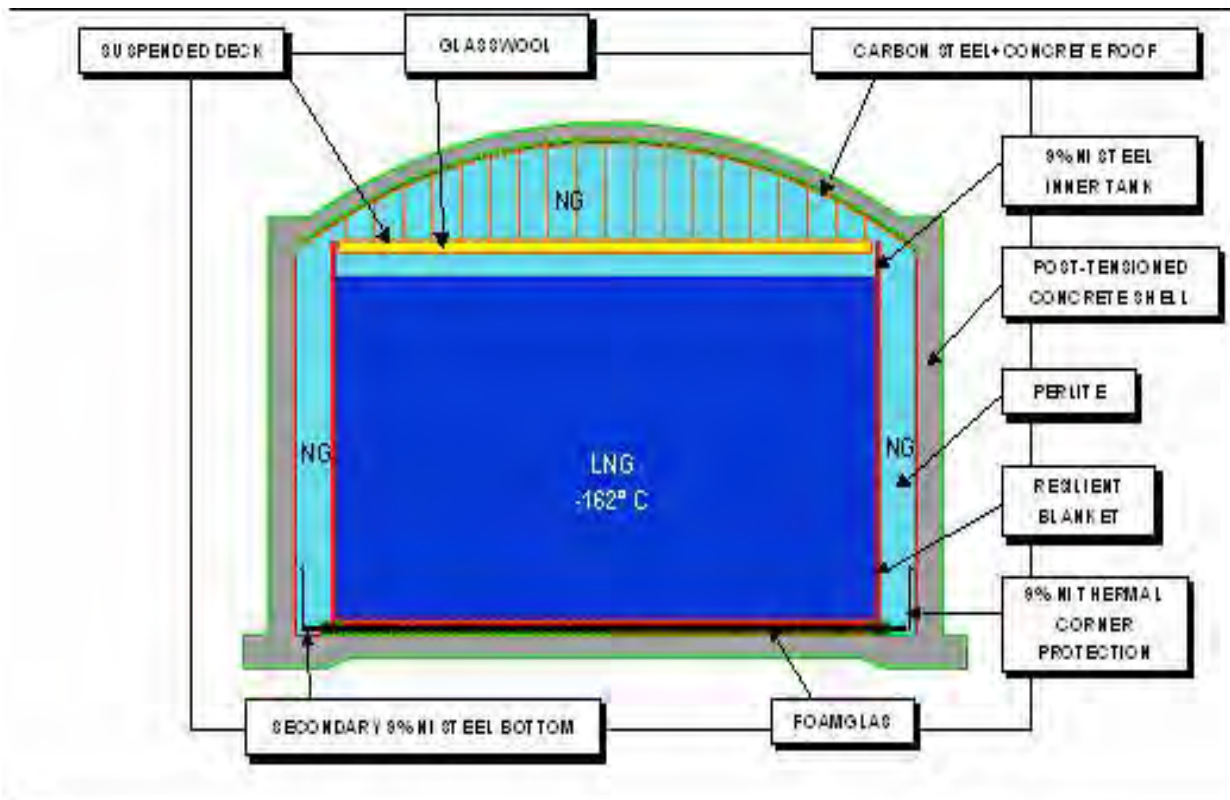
FULL CONTAINMENT LNG STORAGE TANK
